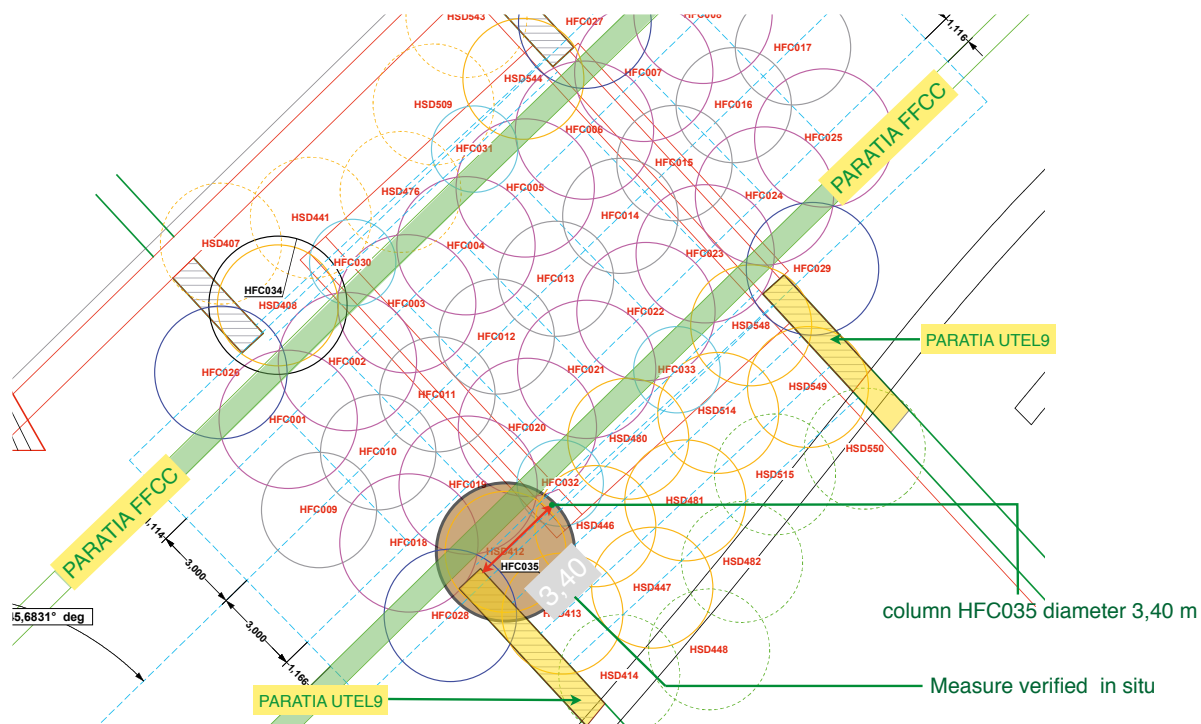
Detail of a closing column between right angle diaphragms; layout drawing.
